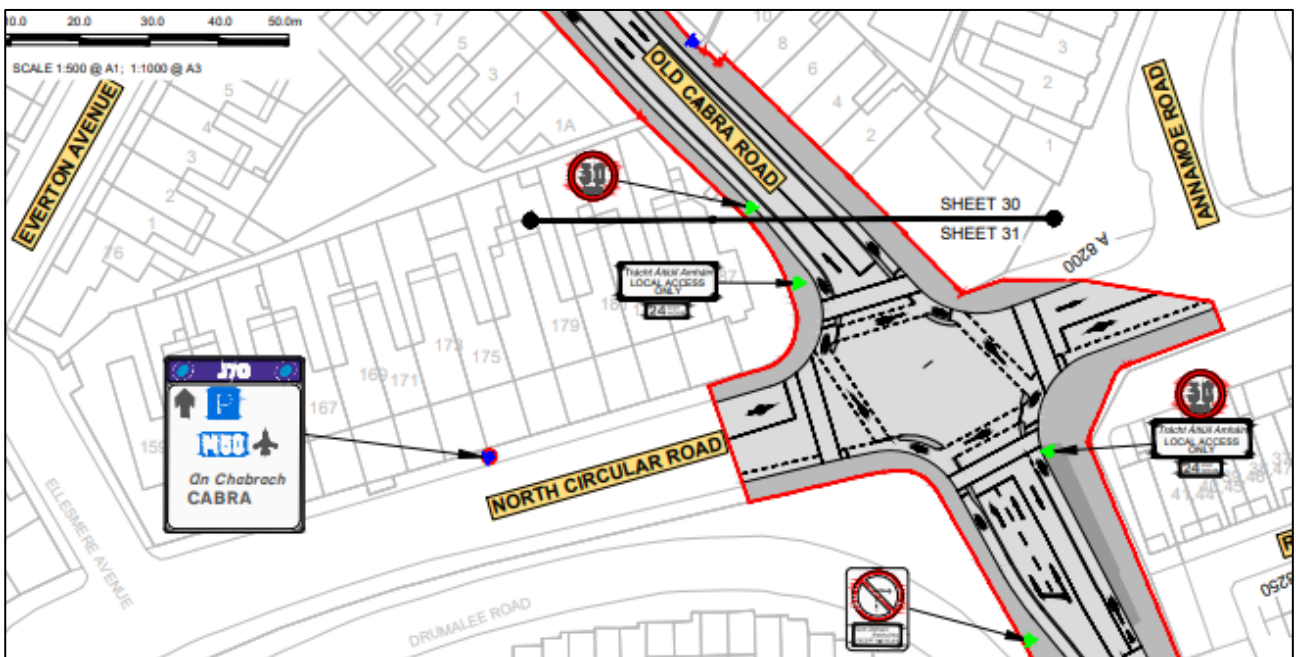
Extract 1 from Traffic Signs and Road Markings Drawings
